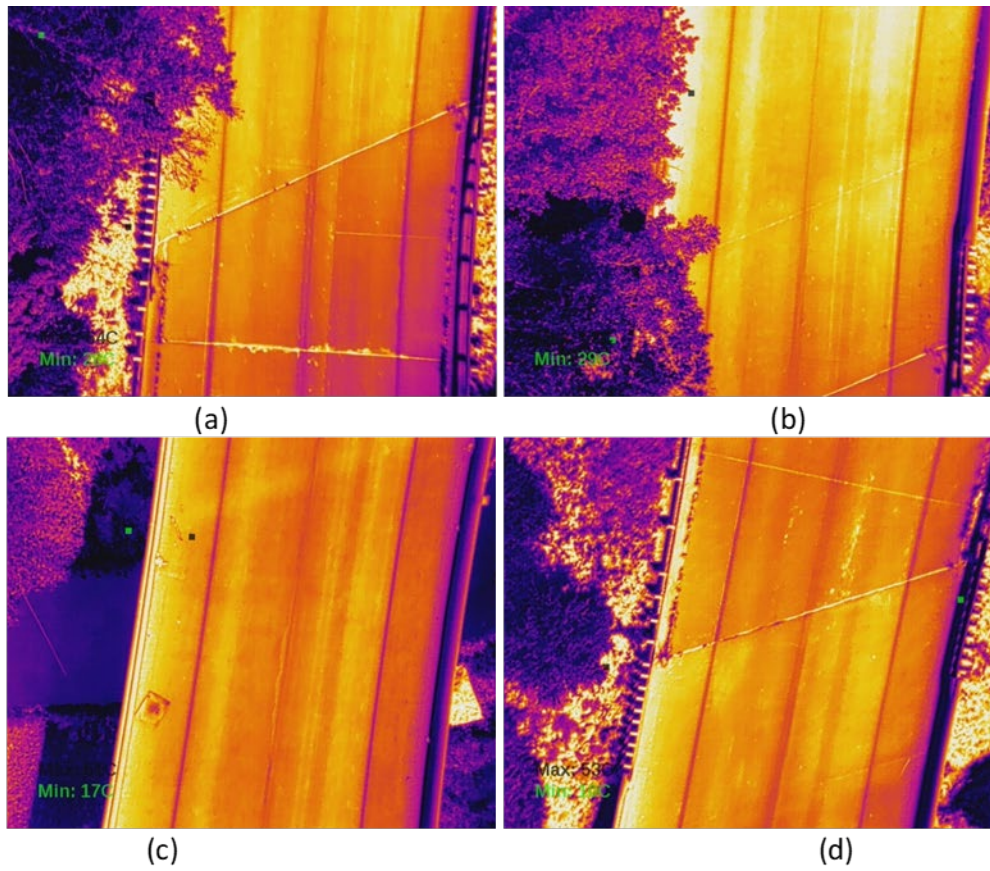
Missouri Prestressed Concrete Bridge A5805 (FLIR)
